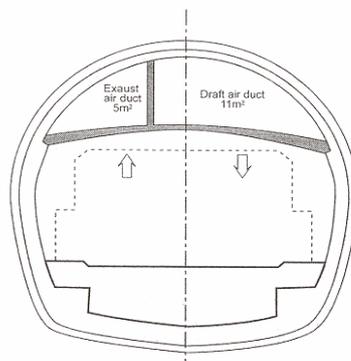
Typical Cross section of horse shoe, transverse ventilation tunnel
